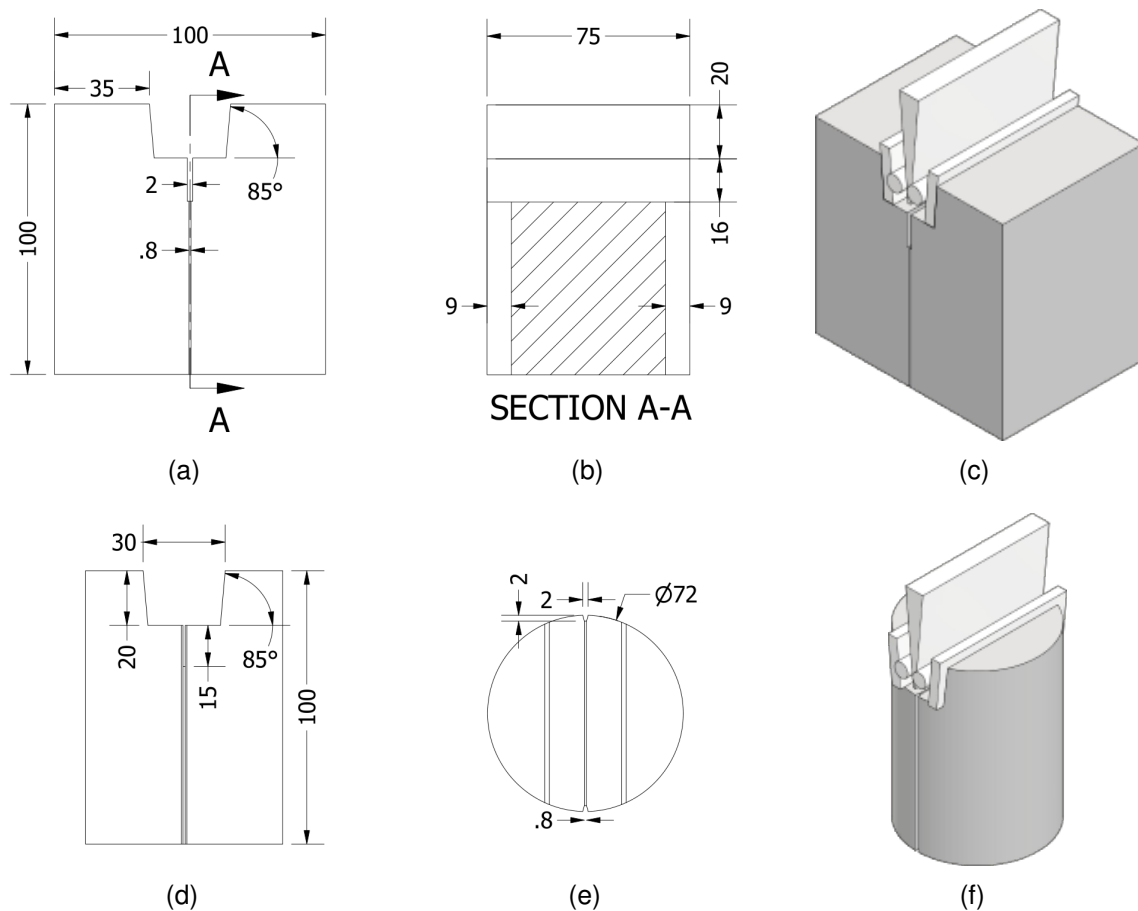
Prismatic and cylindrical samples used in this project, in the first and second rows, respectively (dimension are expressed in mm). (a,d) Frontal views. (b) Lateral A-A section of prismatic sample (a). (c,f) Isometric views with the other parts of the WST setup (see Figure 2.1). (e) Top view of cylindrical sample.
